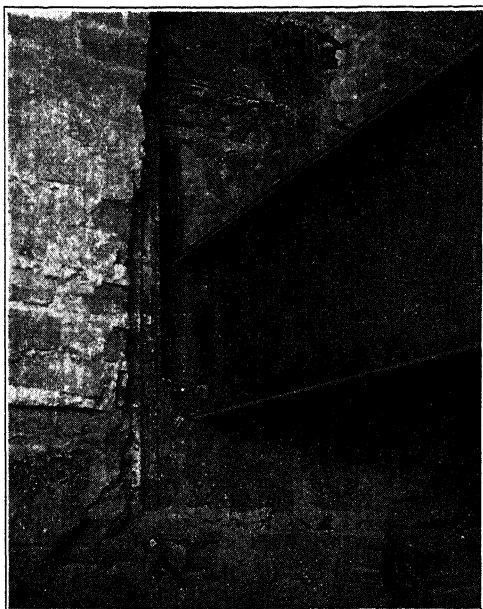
Arc-welded connection of beam to existing column.
